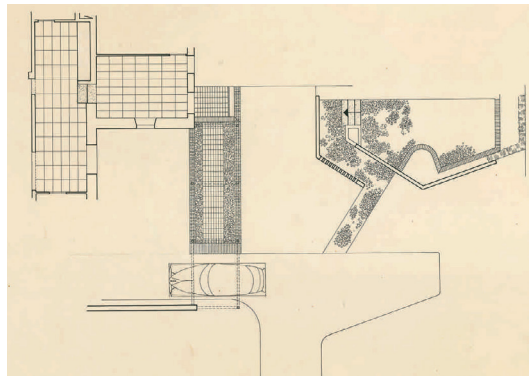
Pergola access to the house. Pavement plans and existing tree encounter details.
